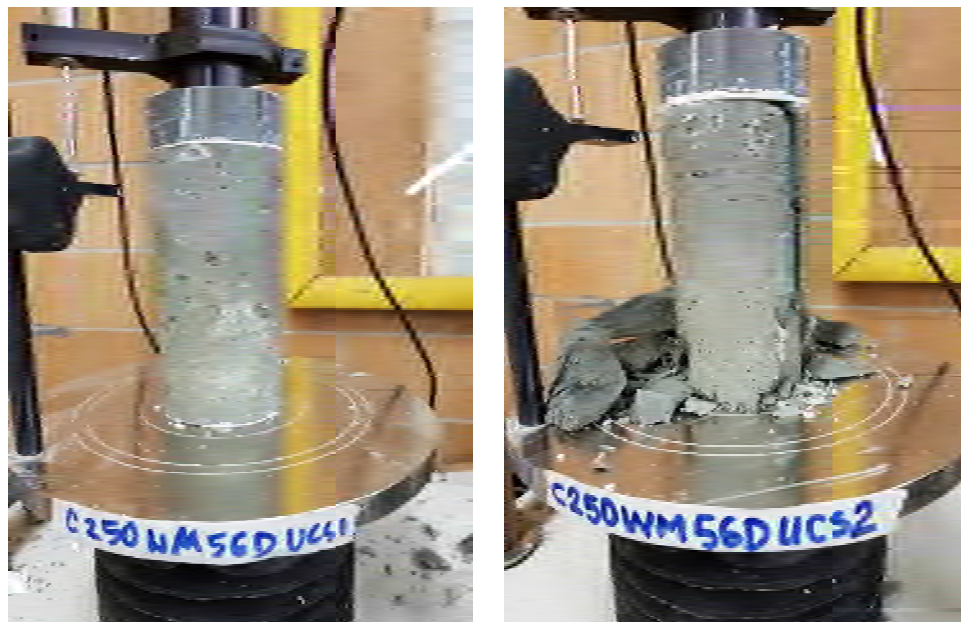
A typical UCS test on a wet mixing sample before and after failure
